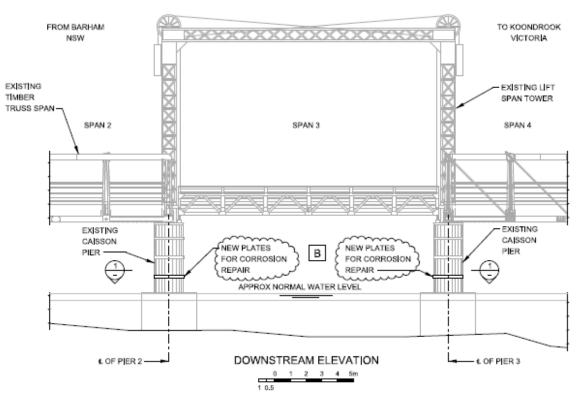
Key features of the proposed modification – caisson repair standard details
